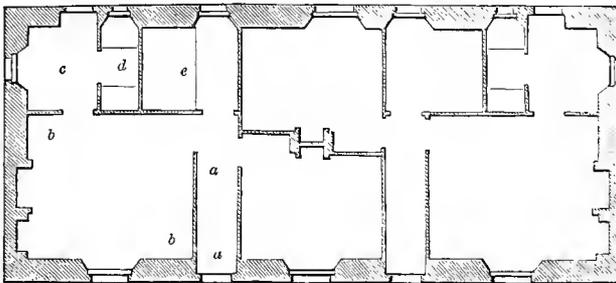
Alternative ground-plan to ground-plan in fig. 741.
